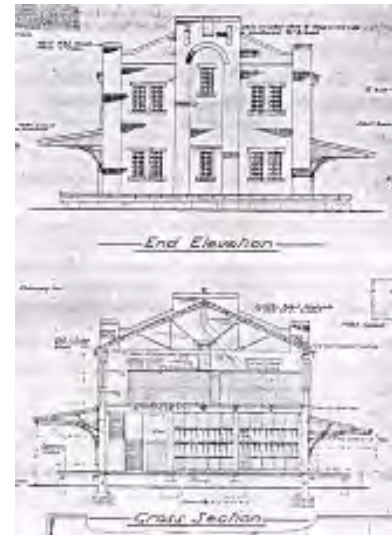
Detail of construction drawing for the General Store, dated December 1911. Source: SRA Plan Room Drawing39-25.
